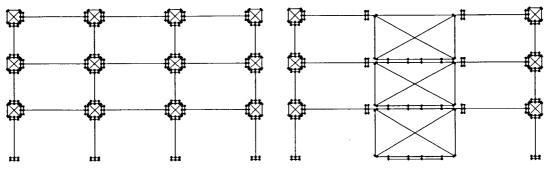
Typical floor plan for the three-storey building before and after rehabilitation
